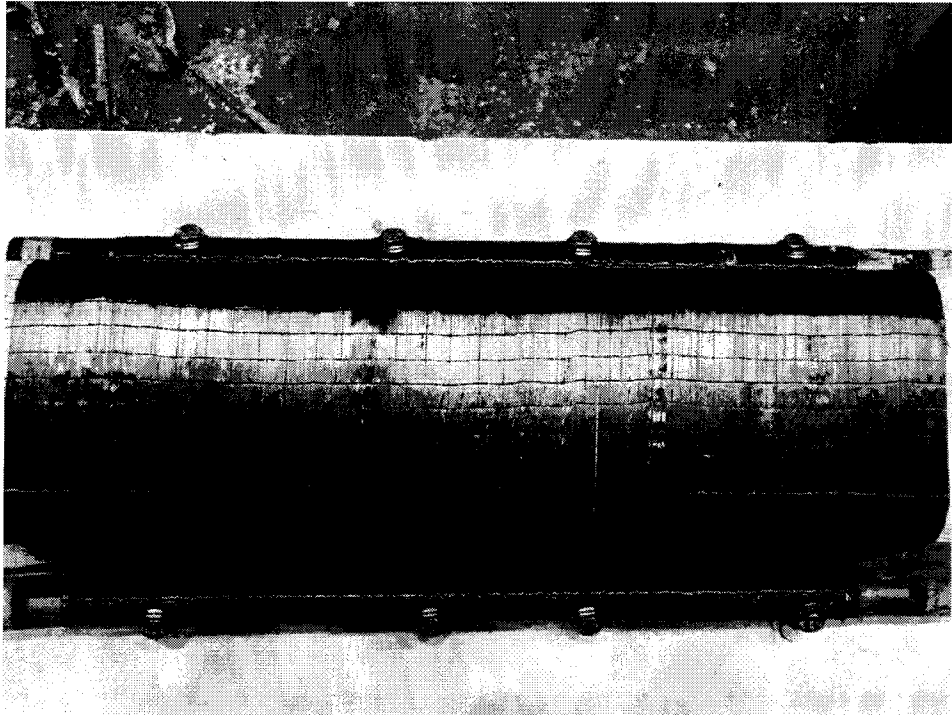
Bottom view of beam B-1 after installing the mechanical anchor
